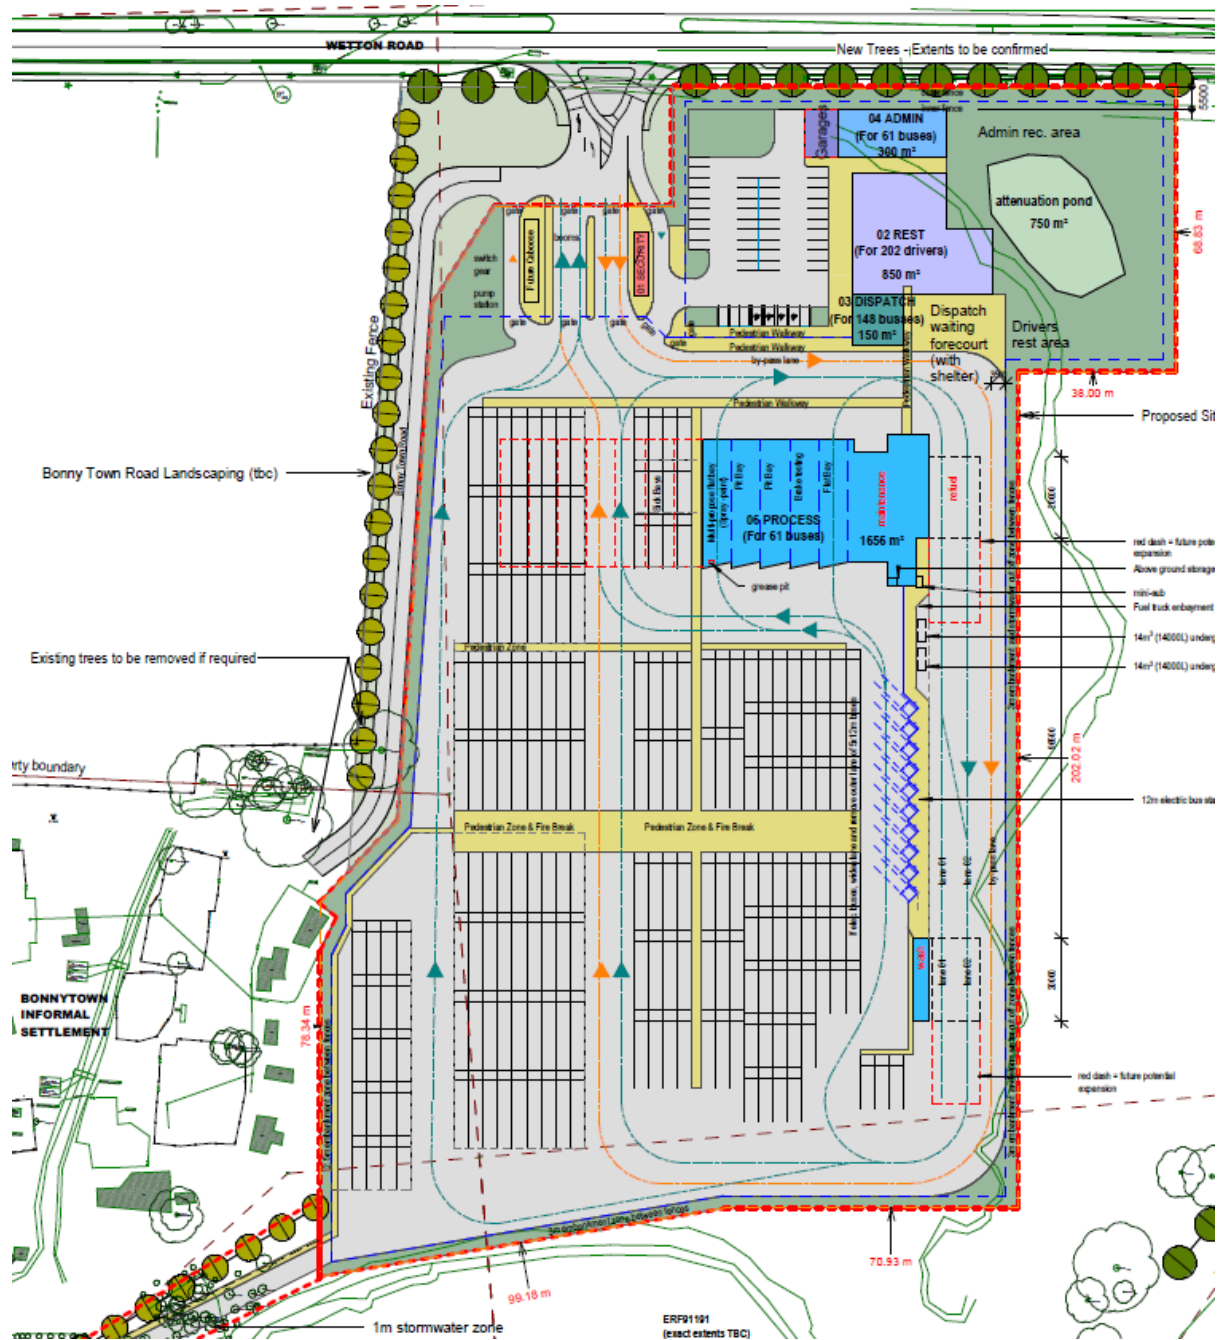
Site development plan of the proposed Wynberg bus depot.
